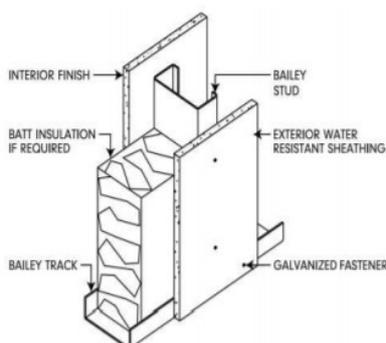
Layers in a steel infill wall (Bailey Metal Products, 2019).
